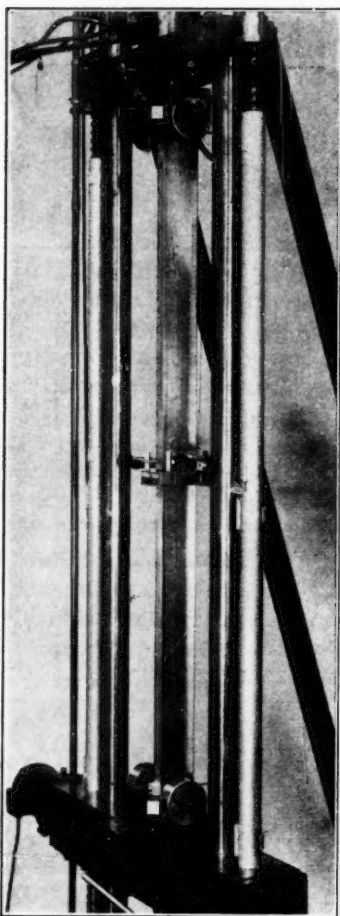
ECCENTRICALLY LOADED COLUMN SPECIMEN 10 IN POSITION FOR TESTING
